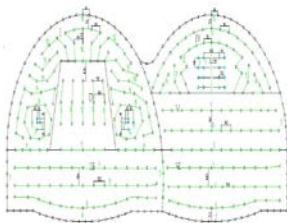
Blast holes layout for smooth blasting of underlying tunnel and detonation network diagram
